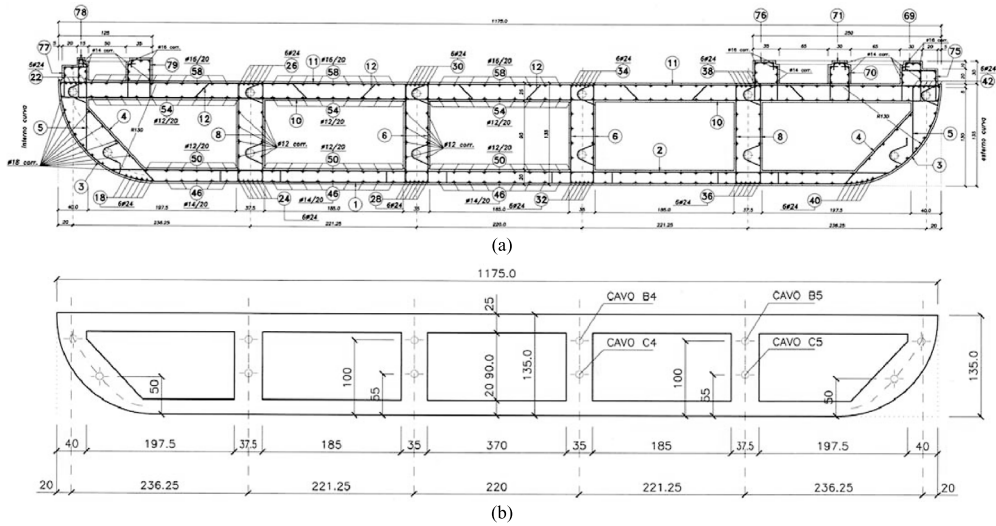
Multi-cellular bridge deck. (a) Reinforcement layout. (b) Prestressing cables.
